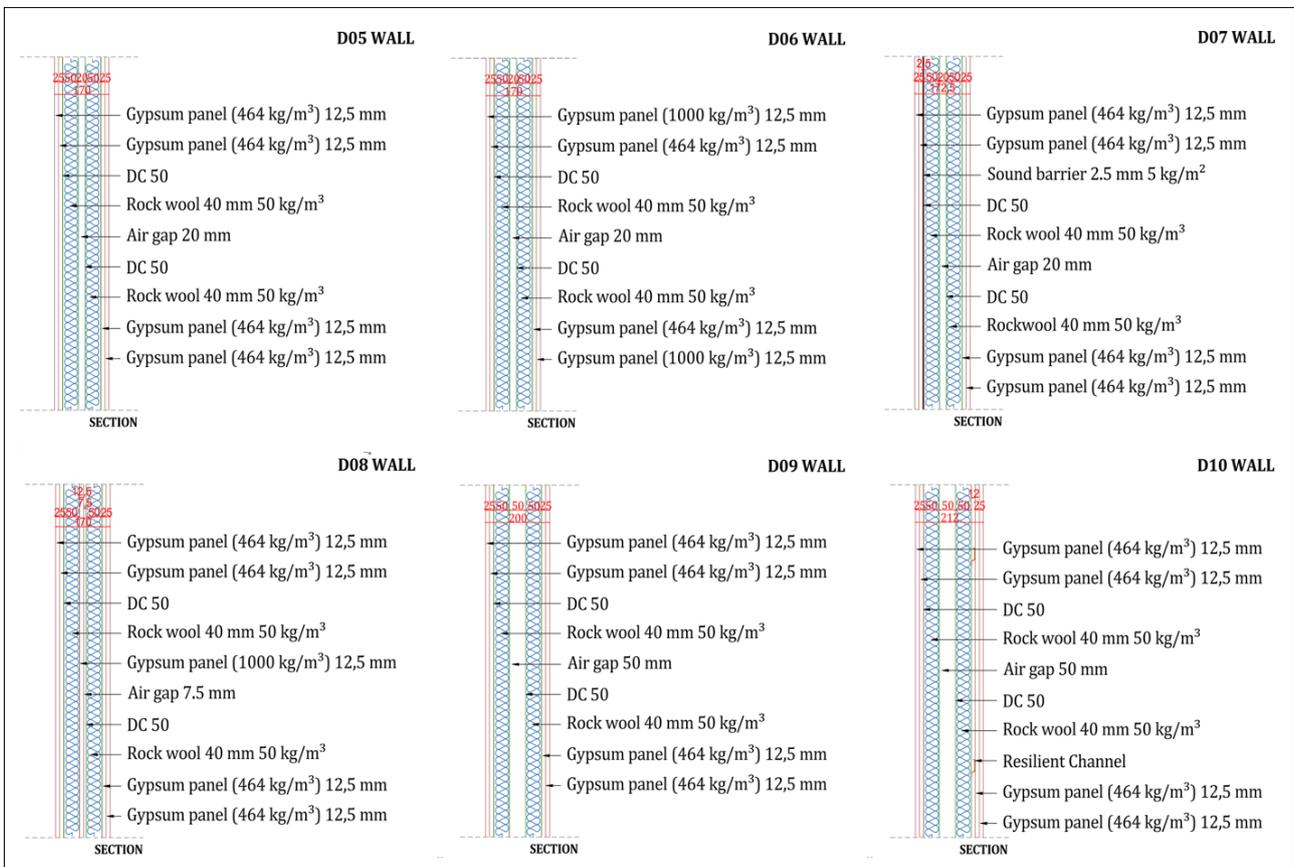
Double-Frame Gypsum Board Partition Wall Systems Manufactured at TSE (Credit to authors).
